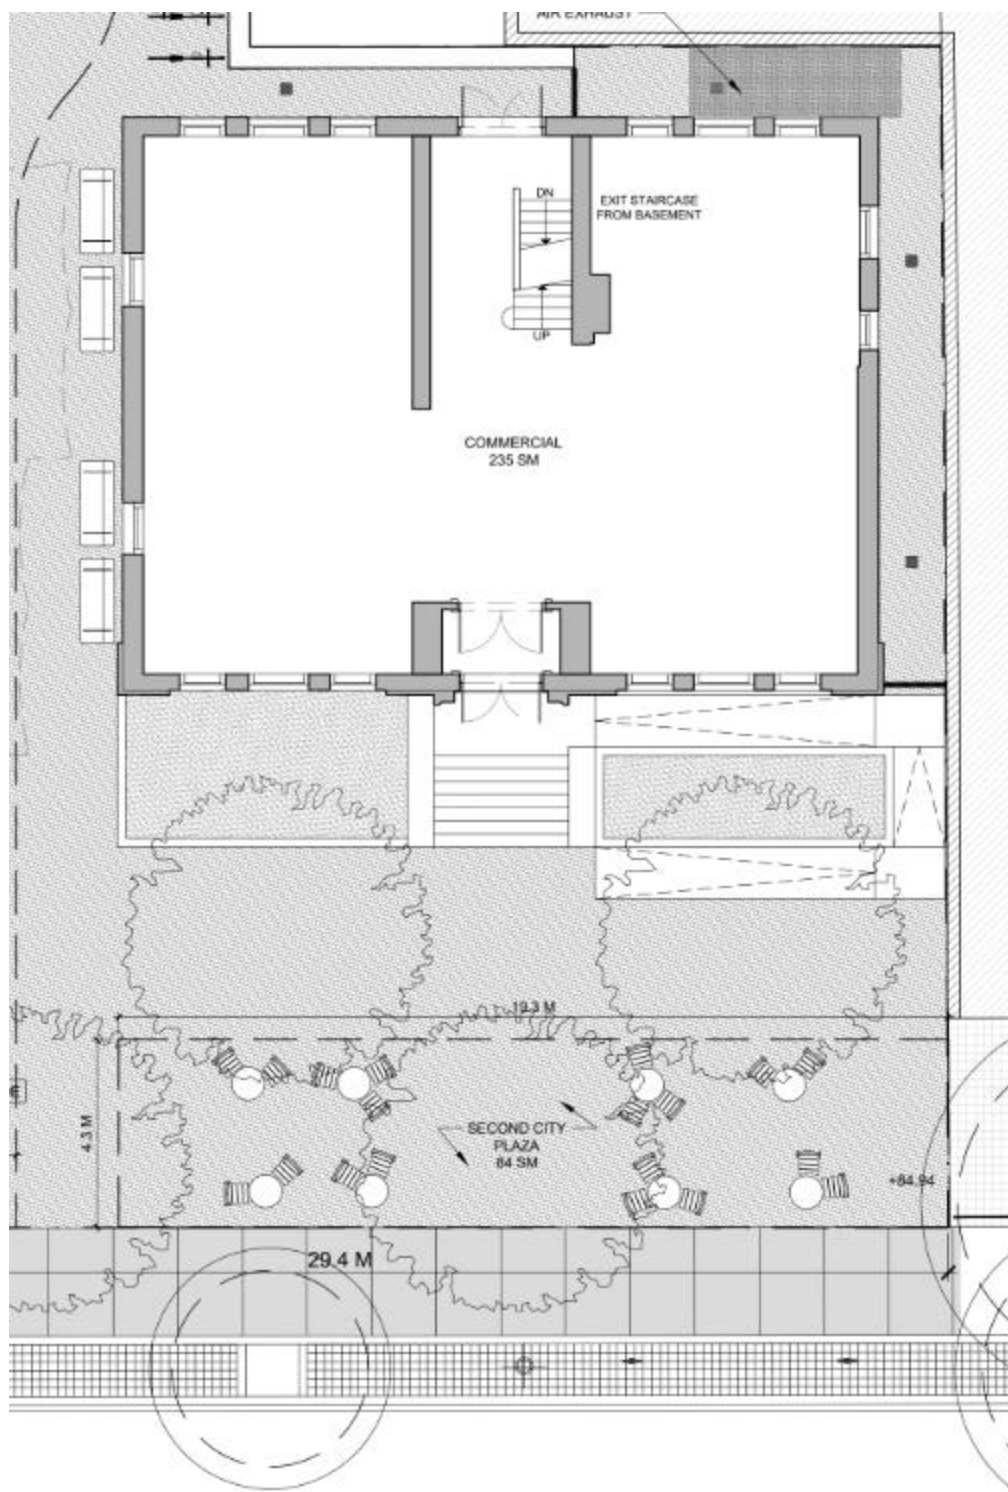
Proposed ground floor plan for 86 Lombard Street included for illustration purposes (OMA & WZMH, 2024).
